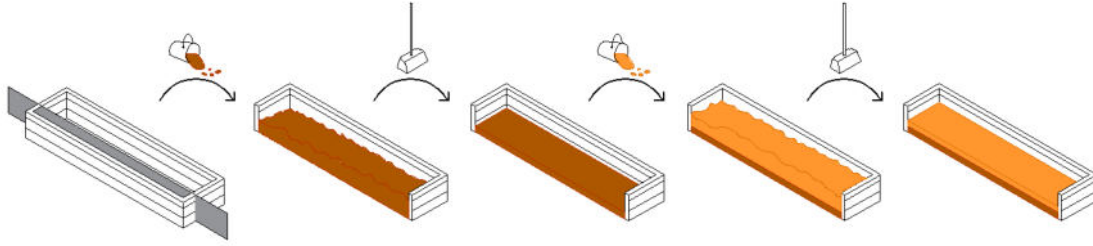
Process of building a rammed earth wall (author’s graphic presentation)
